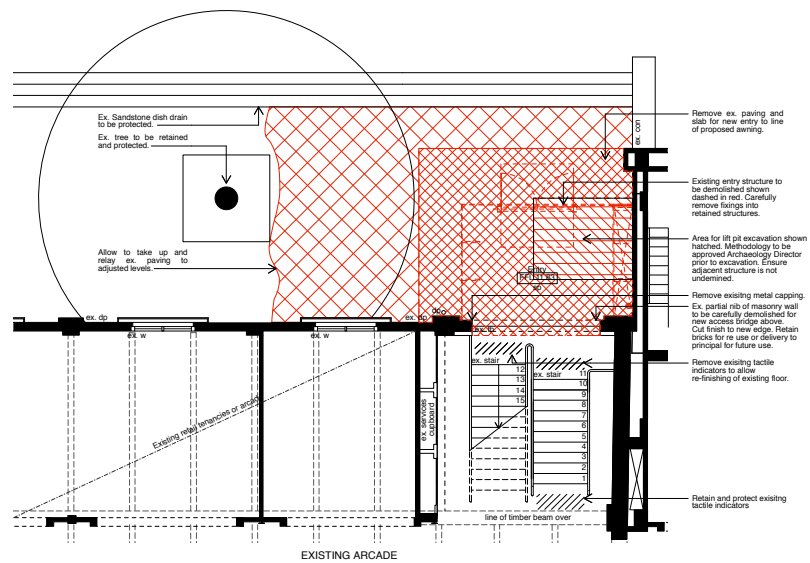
Ground floor demolition plan prepared by Welsh + Major Architects showing the extent of the proposed works.
